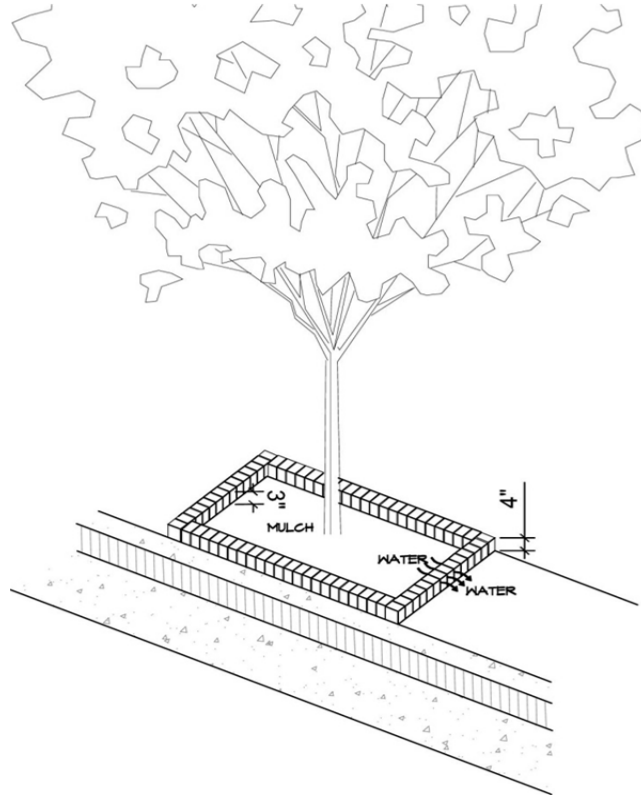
Standard Landscape Zone Treatment – Brick Edger
